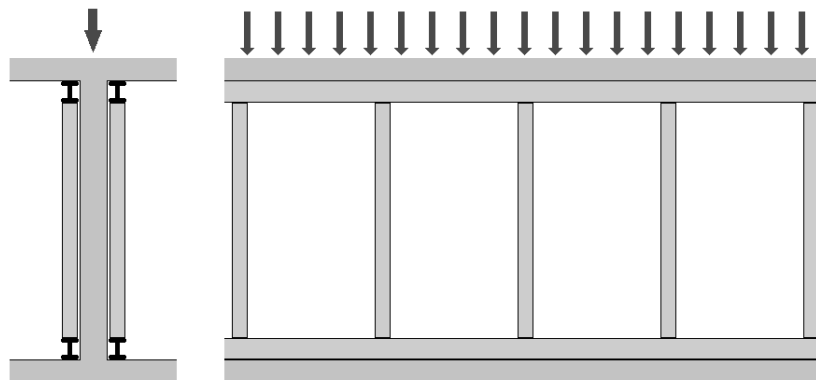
Strengthening of walls with external columns and beams, after Statens råd för byggnadsforskning (1978).
